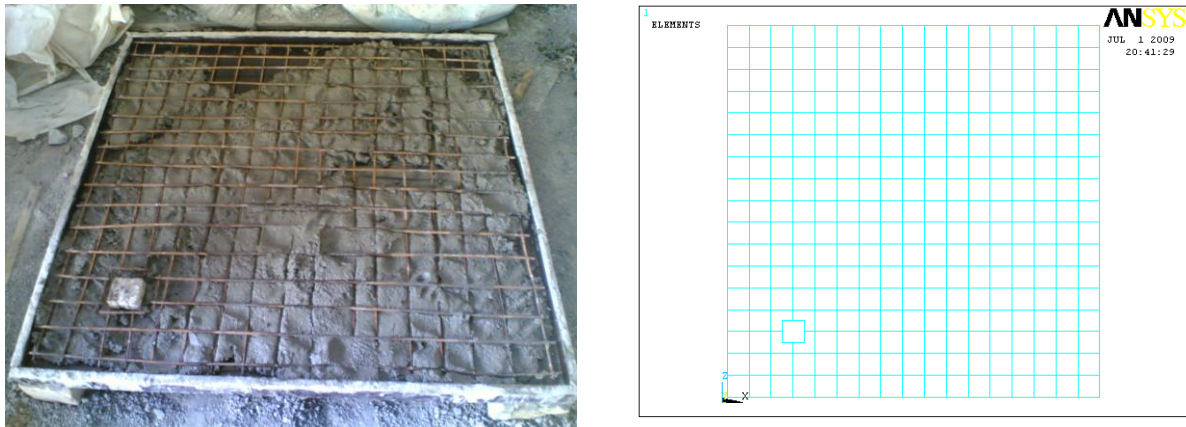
Details of the steel reinforcement for slab specimen B-1.
